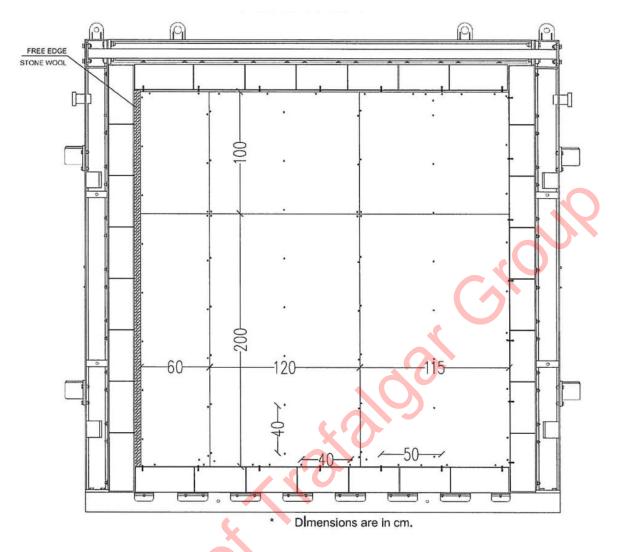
1st layer view of the exposed side of the specimen – extracted from test report
